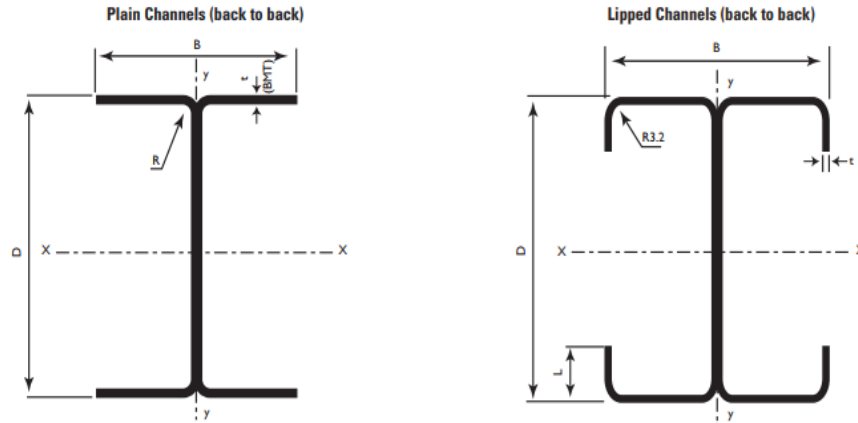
Dimension of the built-up C-section plain and lipped angles
